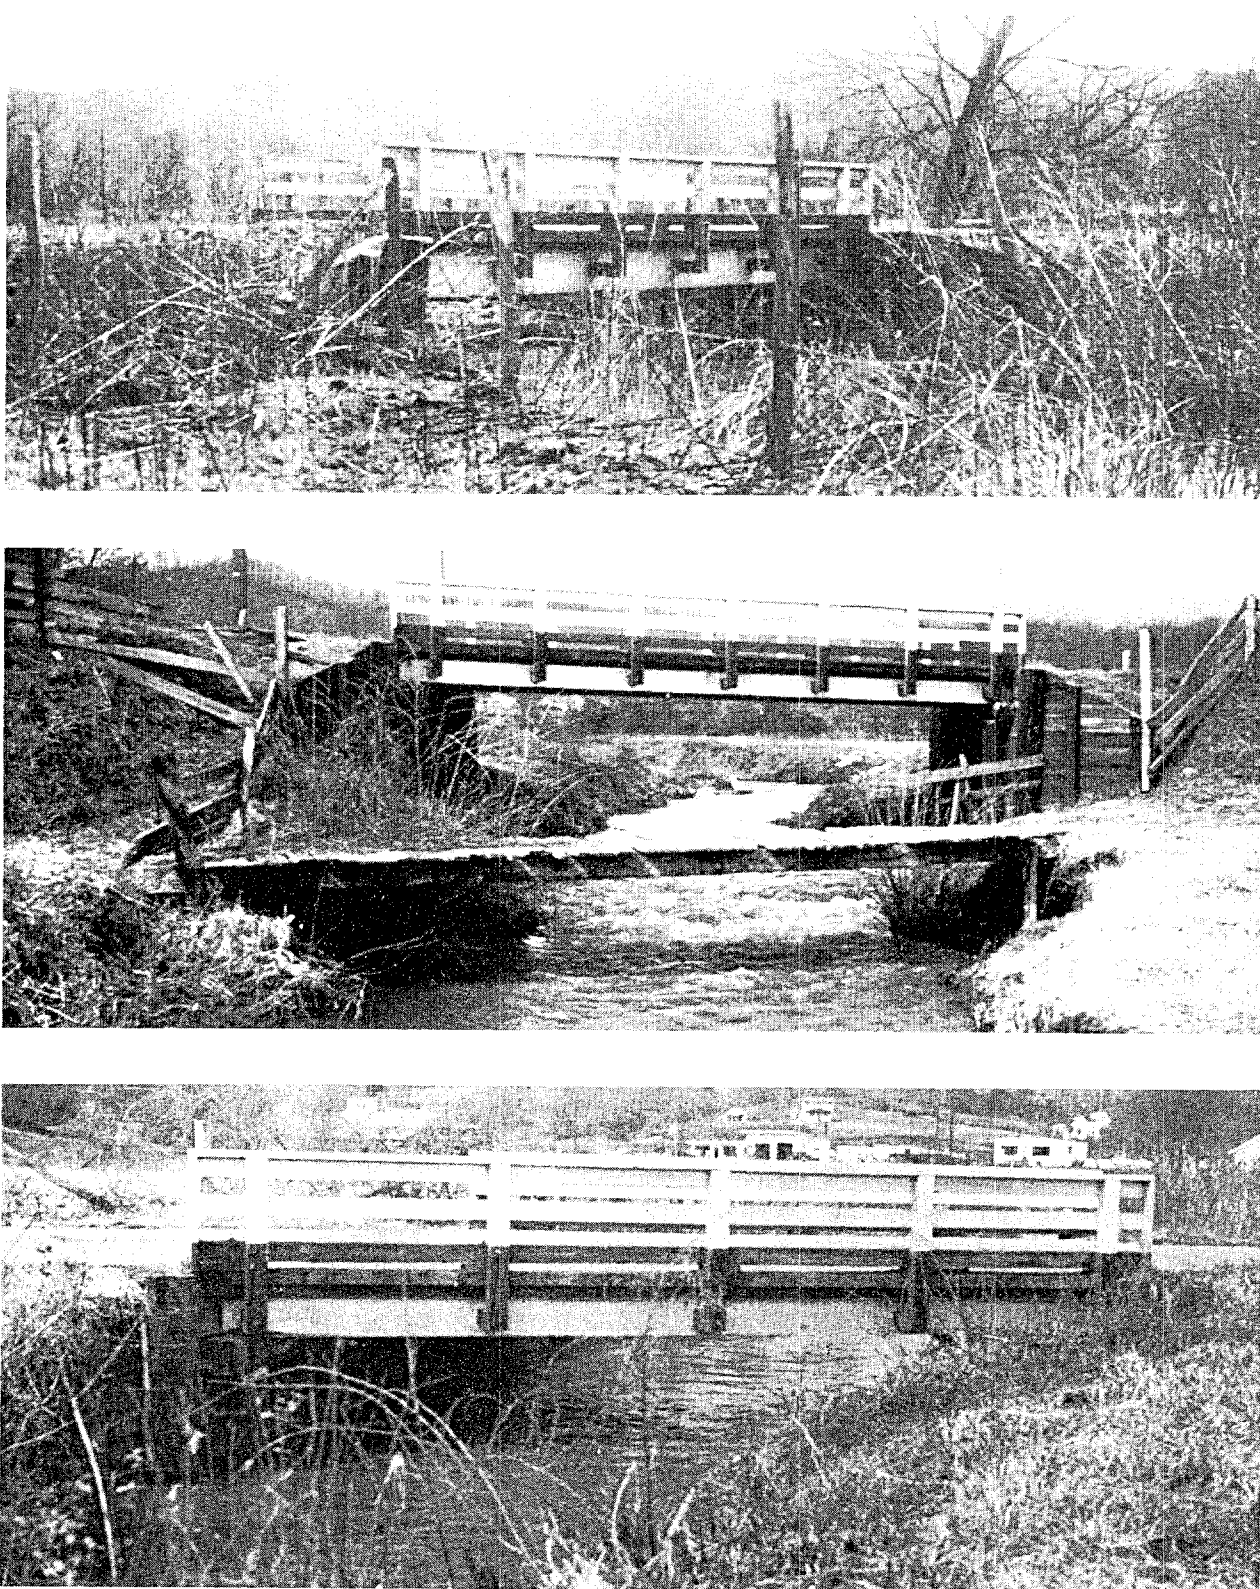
NICHOLSON CREEK BRIDGES BELOW U. S. HIGHWAY 64
